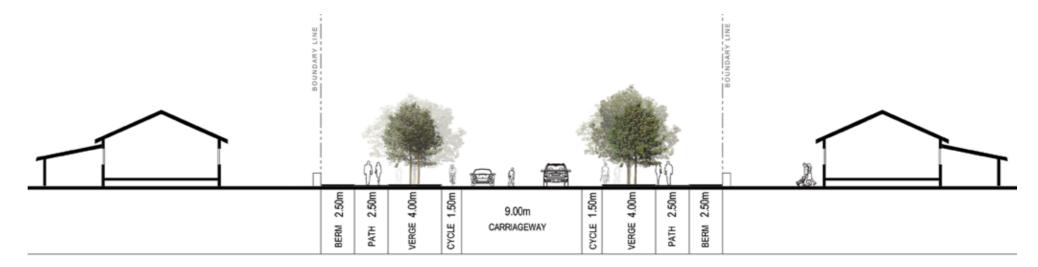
Indicative street layout, showing preferred uses within a 20m carriageway, with dwellings overlooking street.
